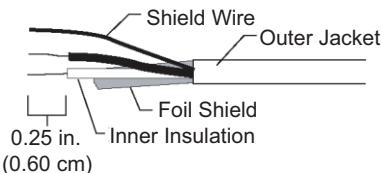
Wiring Equipment Touch Interface to UC Open XP Controller
